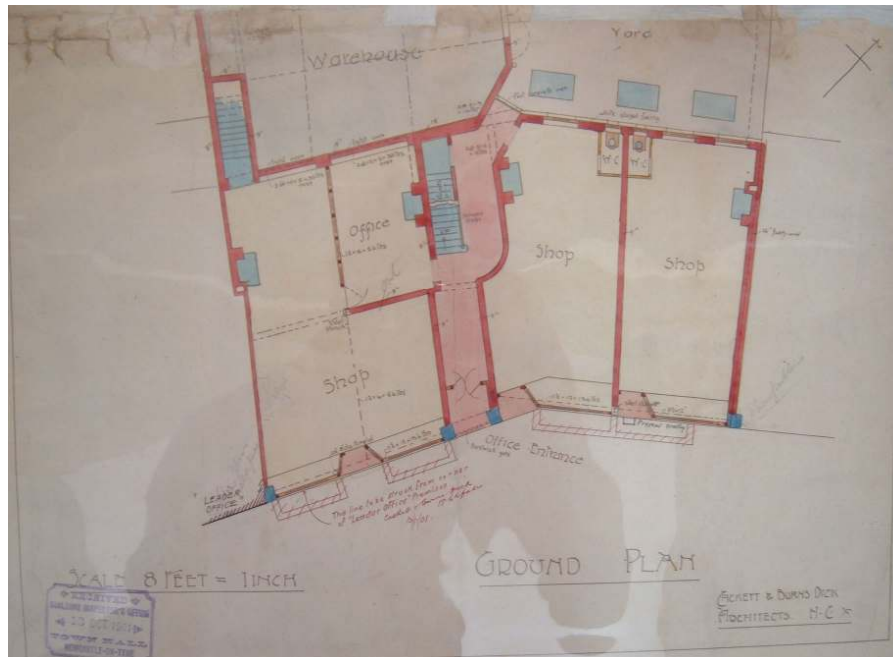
Plan for proposed rebuilding of 1901, by Cackett and Burns Dick.
